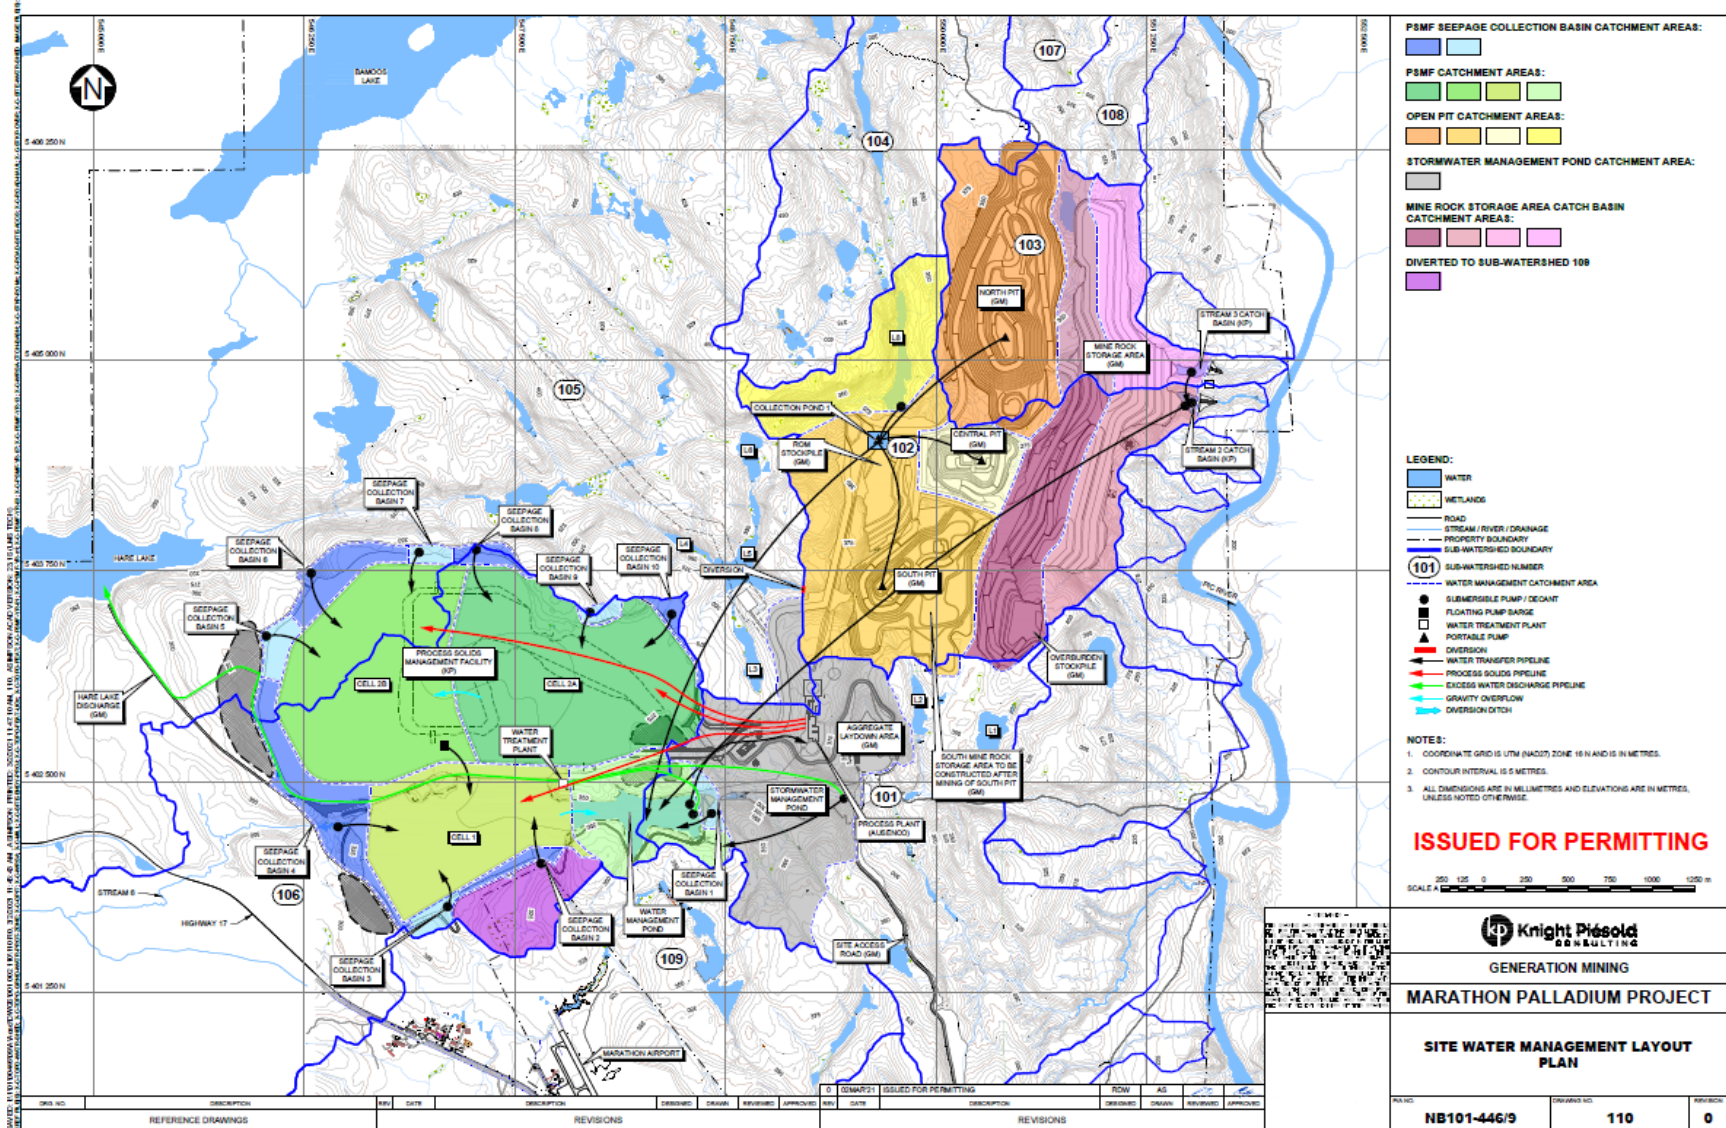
Site Water Management Plan Layout – Operations (Source: KP, 2021)
